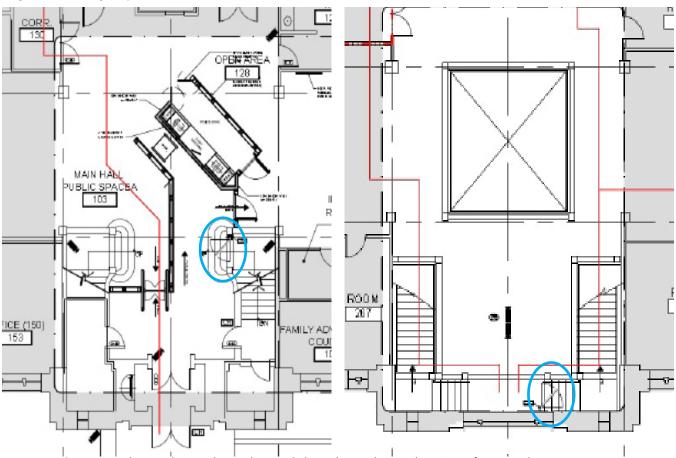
Main Floor Plan-layout by a+LiNK Architecture. Refer to Enlarged Plan in Appendices.
